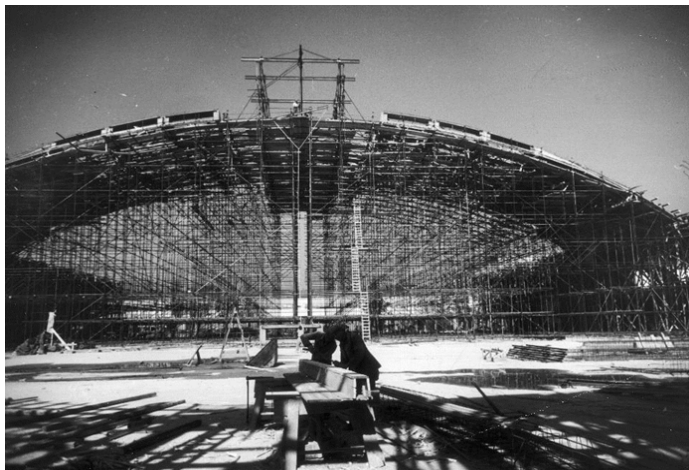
Rolling scaffolding towers to provide support and speed of erection.
